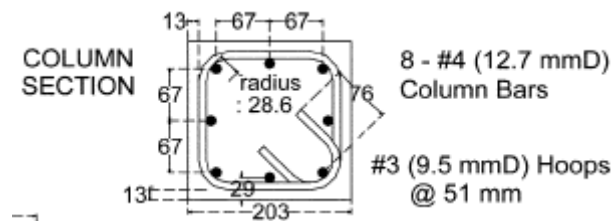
Kang and Wallace, 2004 [5], column reinforcement.
